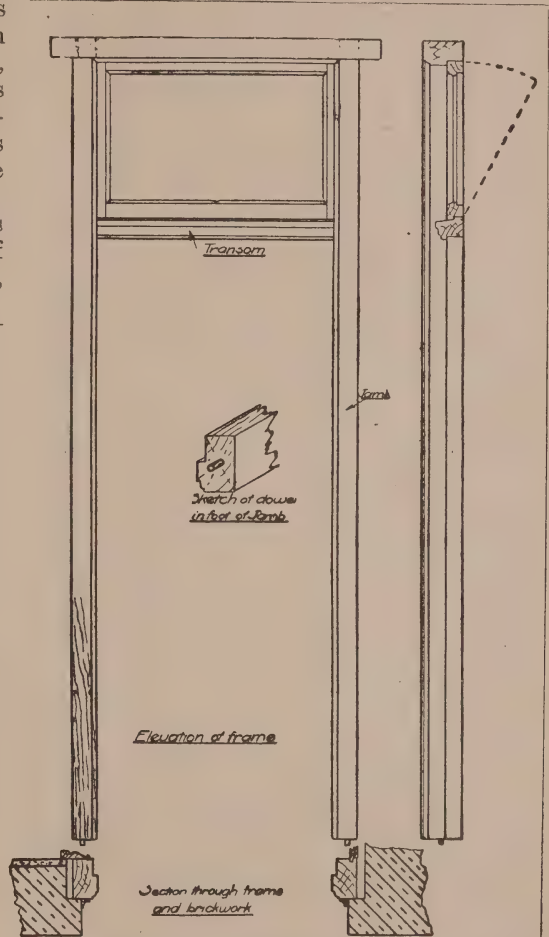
Front and Side Elevations and Sections of Door Frame
